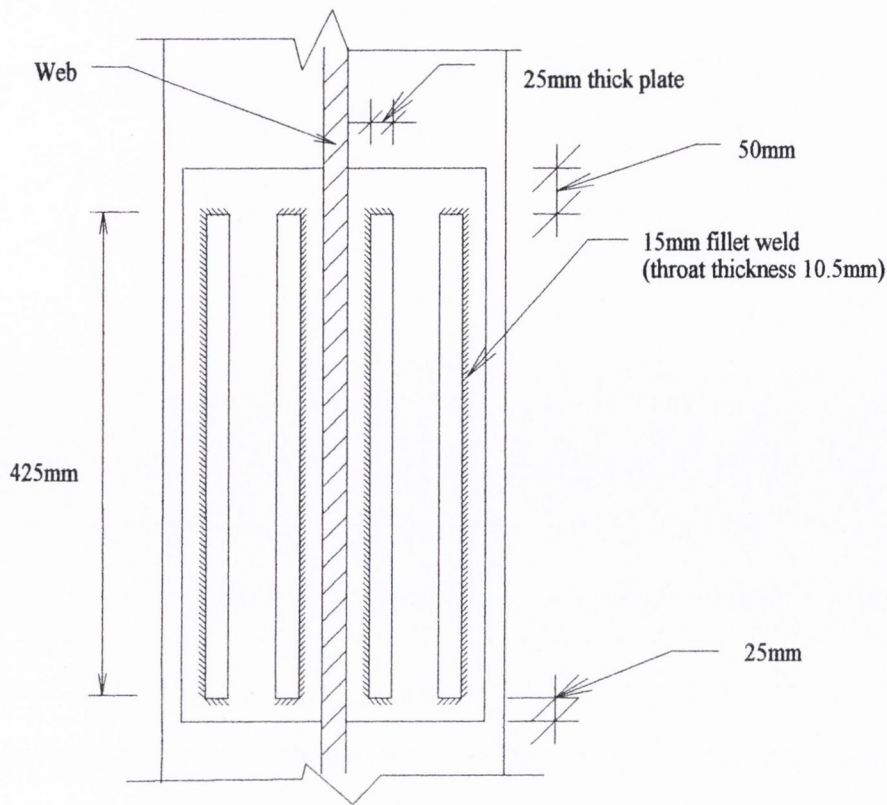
Section through vertical lever plates connected to the upper flange plate.
